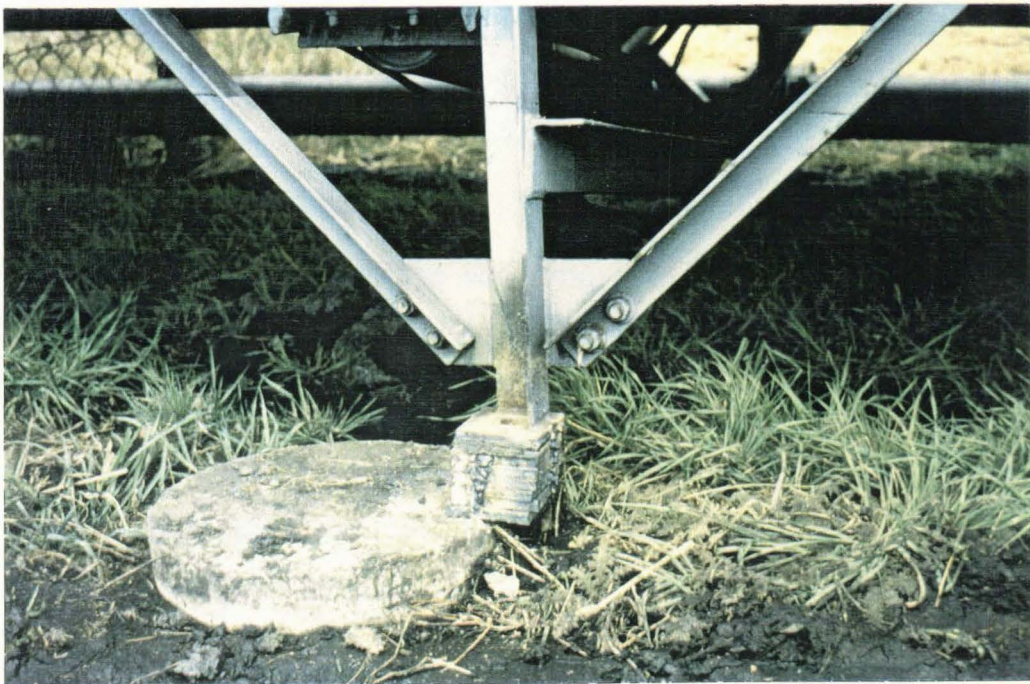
Detail of a leg of the conveyor belt structure, showing the plates which were welded on and the amount of horizontal displacement.
